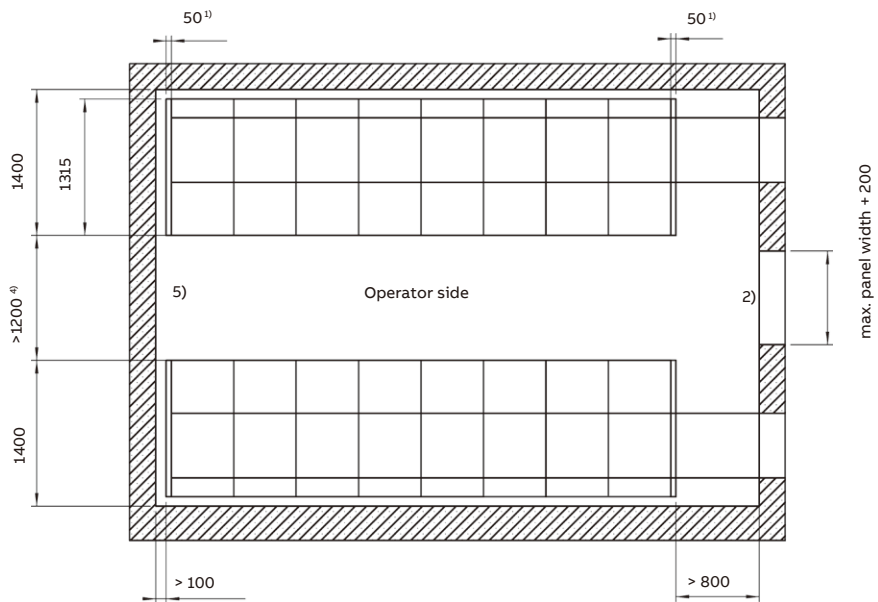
Wall mounting installation, example of a double row installation (Top view, dimensions in mm)
